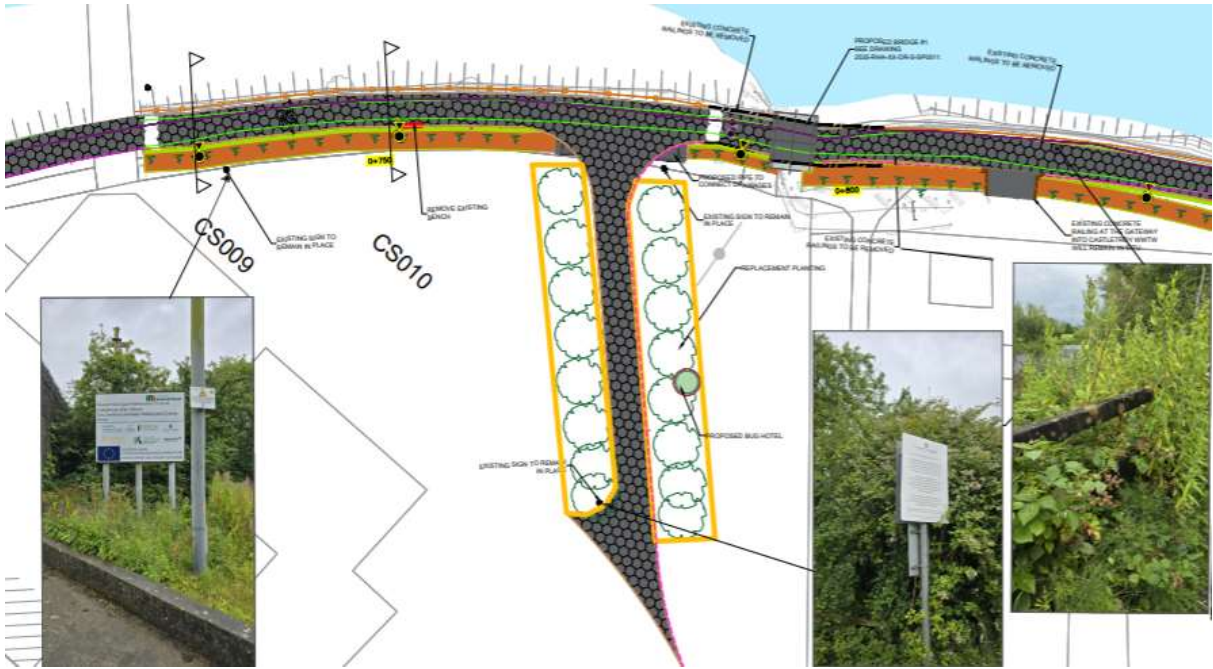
Proposed tree planting area west of proposed Bridge 1
